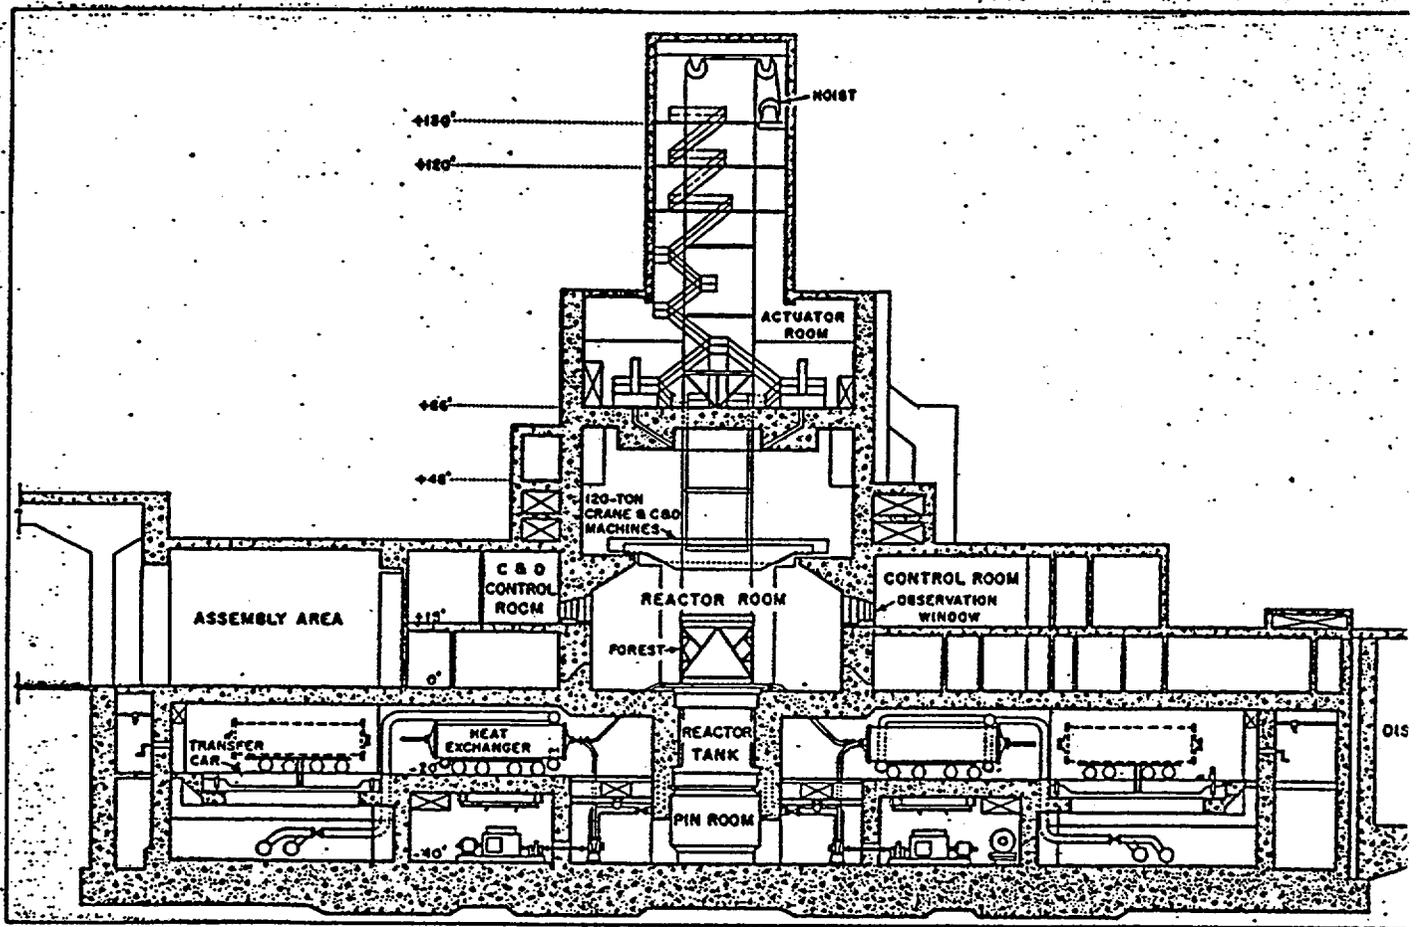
Schematic cross-section through central portion of typical building. Reactor room floor is at grade level. Top of penthouse is at elevation 150 ft.
